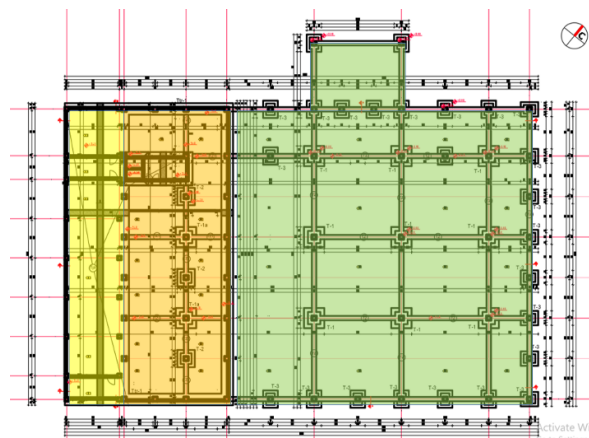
Different types of foundations represented on a Foundation Floor Plan
